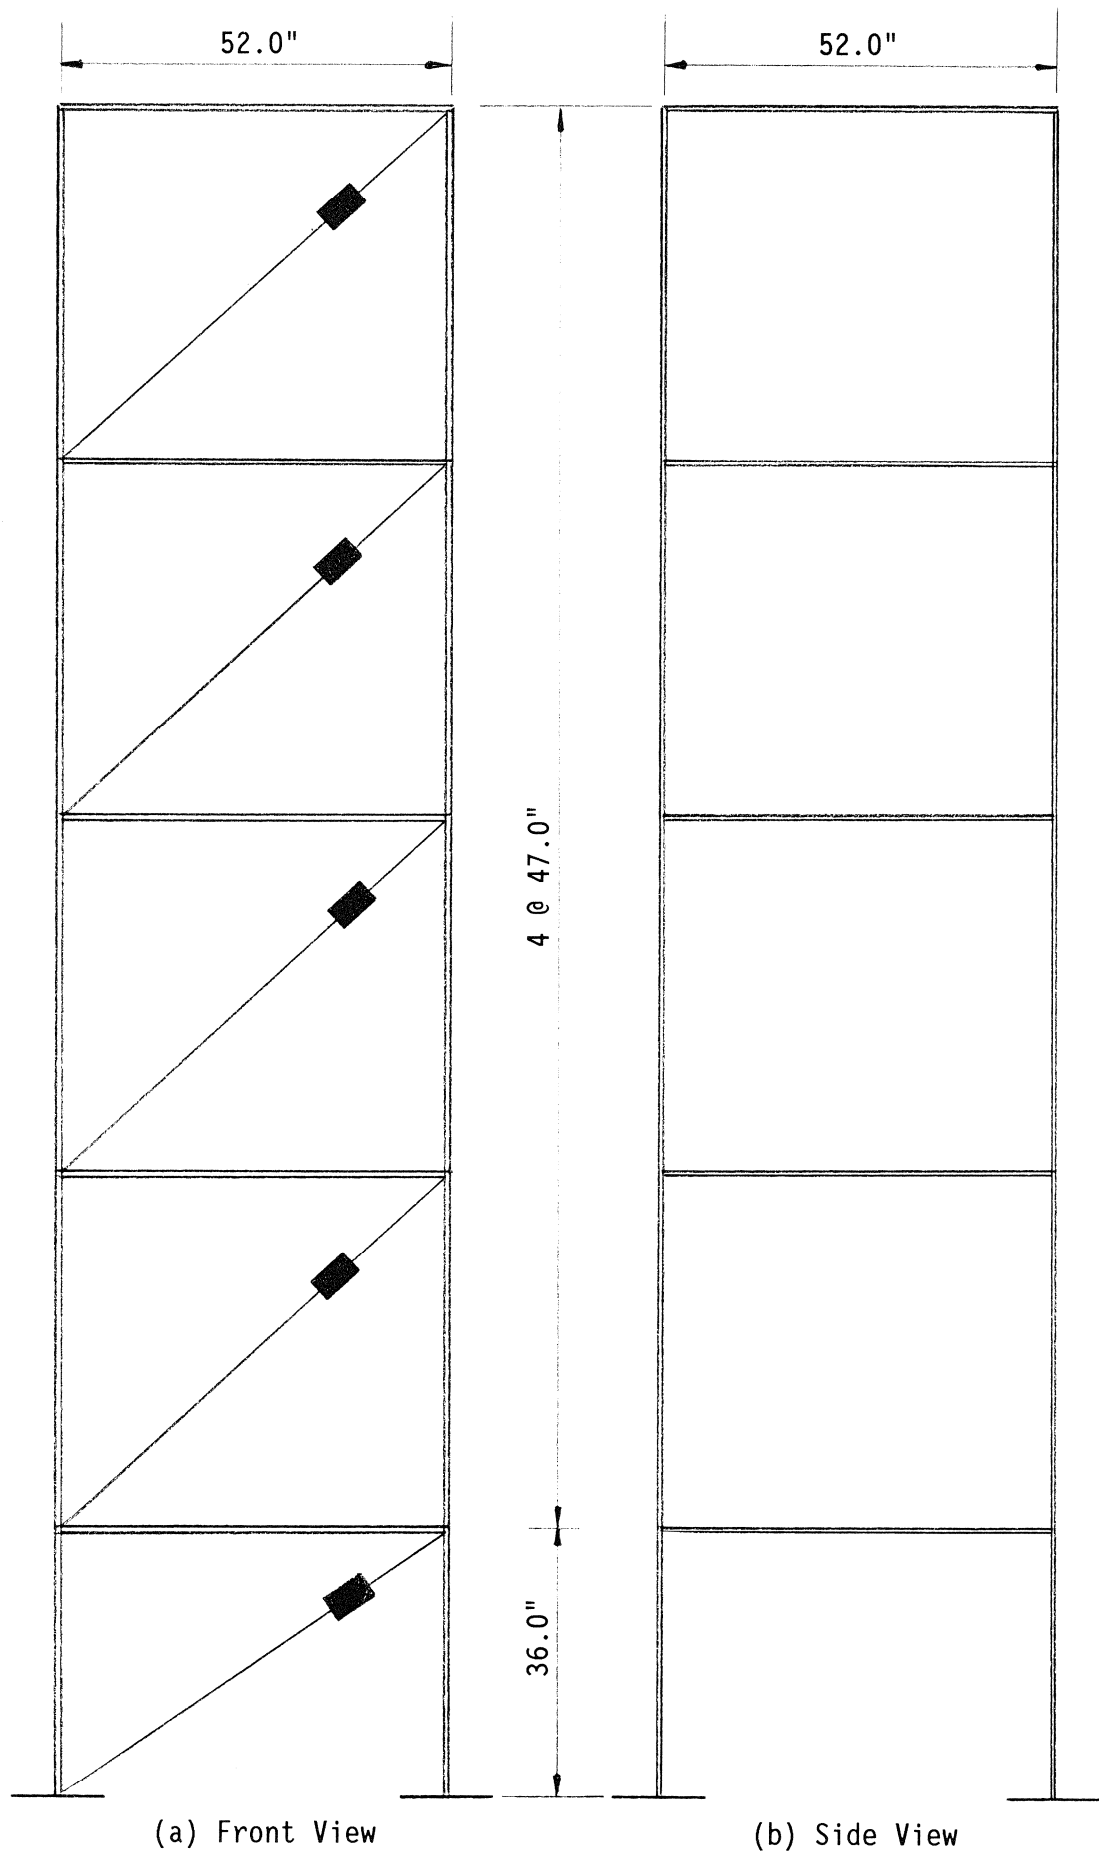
Five-Story Steel Frame with Added V E Dampers
